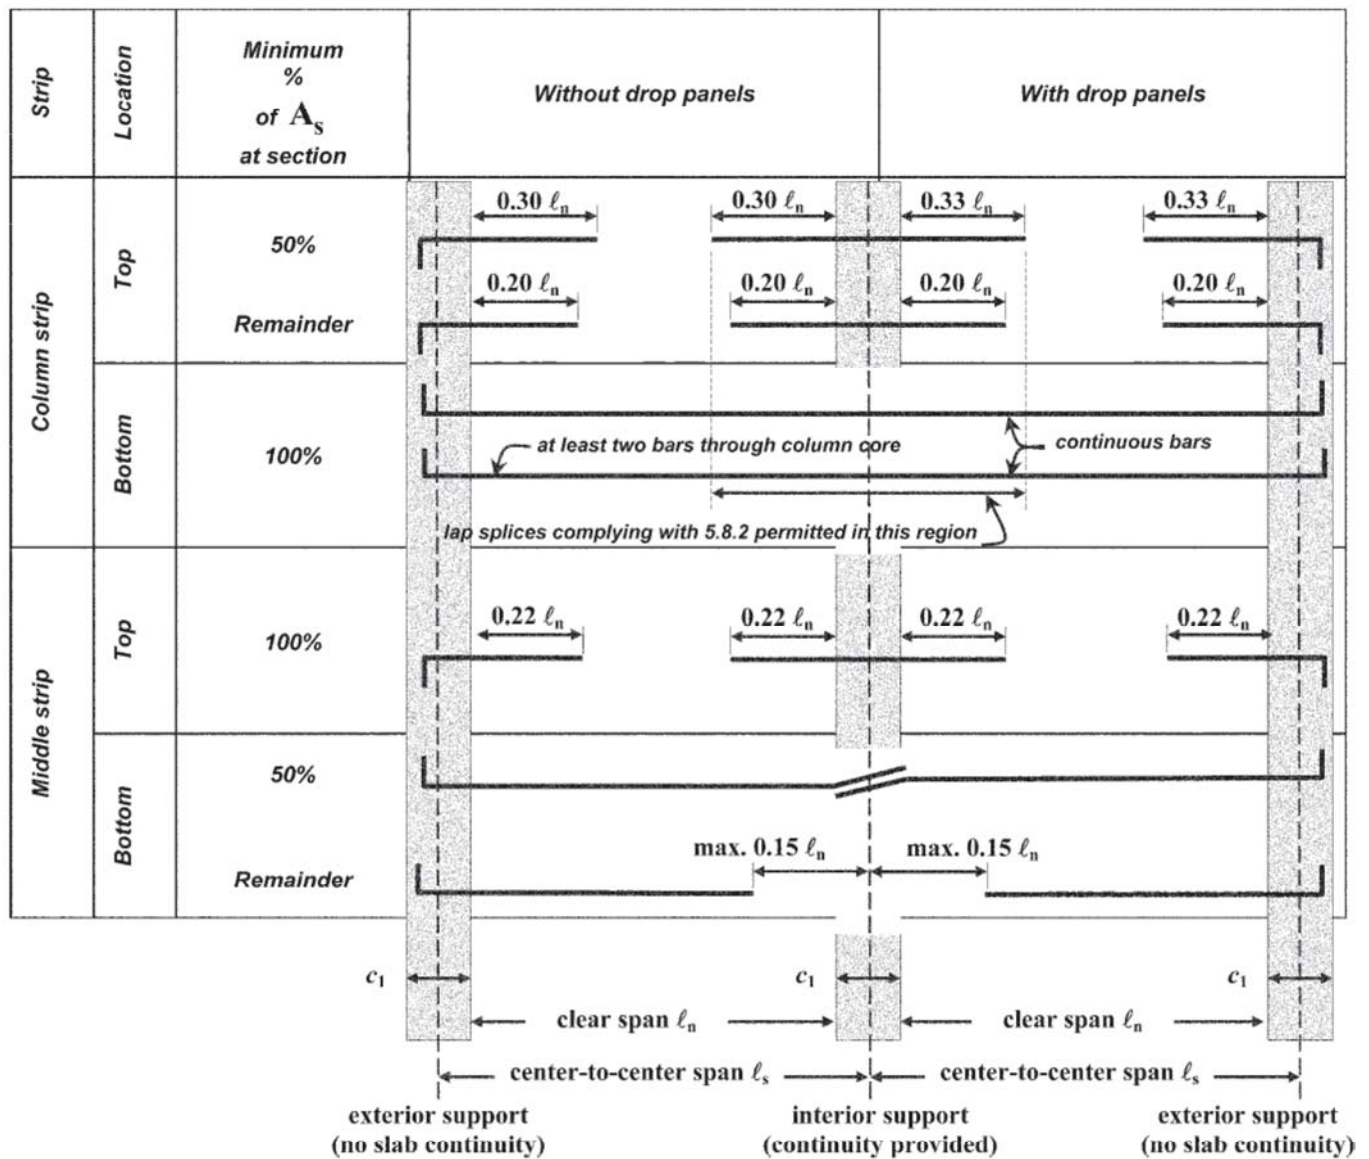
Minimum length of slab reinforcement in slab-column systems.
